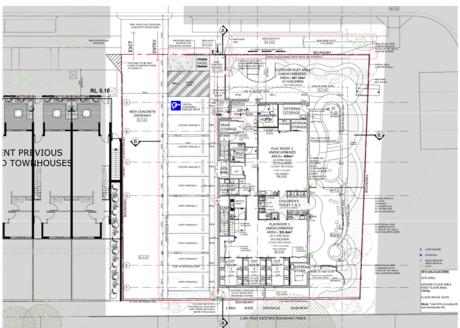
Ground Floor Plan (Source: PTW, 2019)
